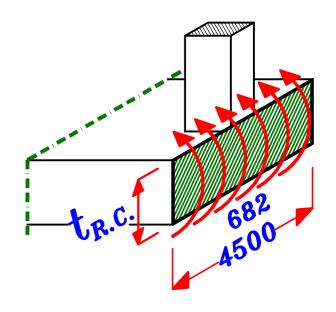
Drawing U.L. B.M.D. on all R.C. Footing. Longitudinal direction.
